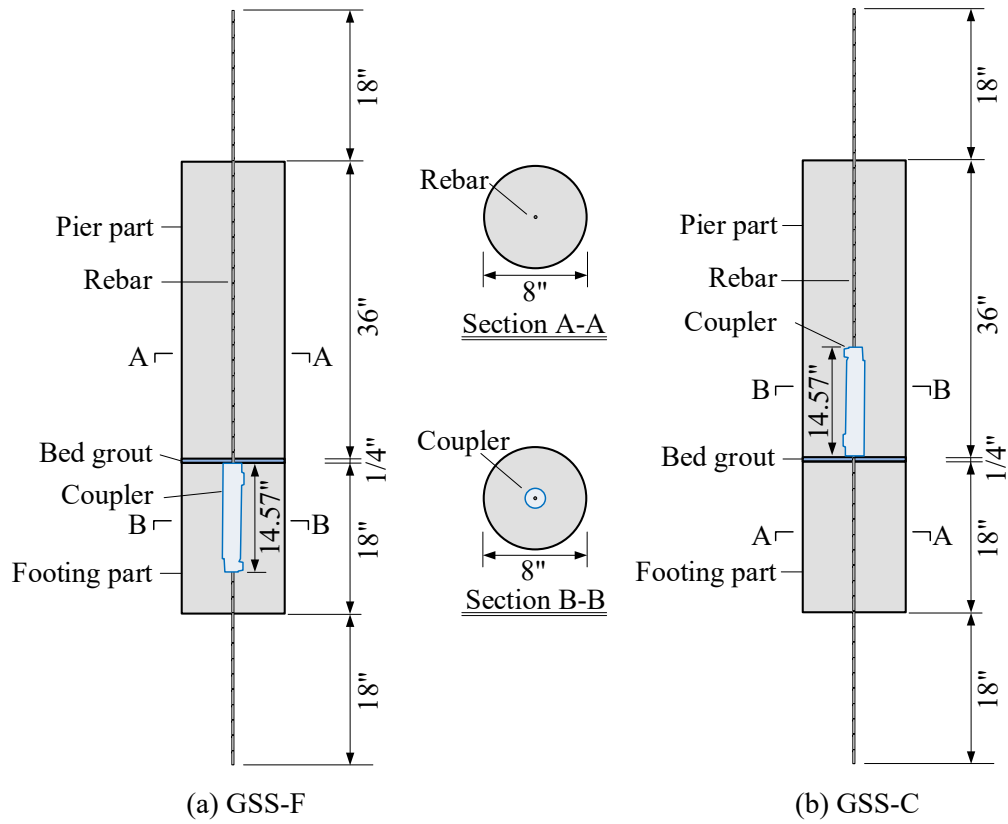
Dimensions and GSS specimen details (unit: inch)
